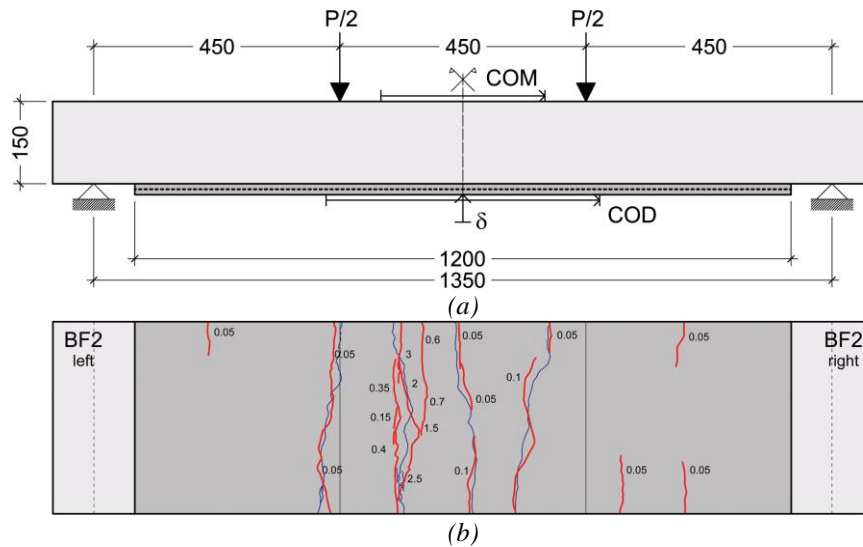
Four-point bending test scheme and instruments arrangement (a). Cracking pattern (b) on the intrados after the pre-damaged test (blue) and the post-reinforced test (red). Crack openings refer to the post-reinforced beams. [Dimensions are in mm].
